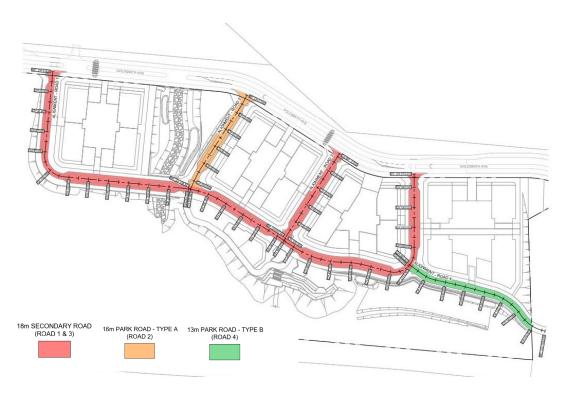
Road hierarchy (Source: Civil Engineering, Services & Infrastructure Master Planning Report, Attachment H)
